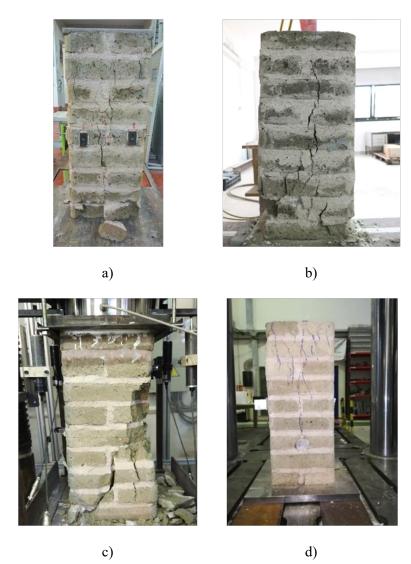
Unreinforced Tuff masonry specimens after testing: a) 1_URM UniPa; b) 2_URM UniSal; c) 1_URM UniFi; d) 1_URM UniSa.
